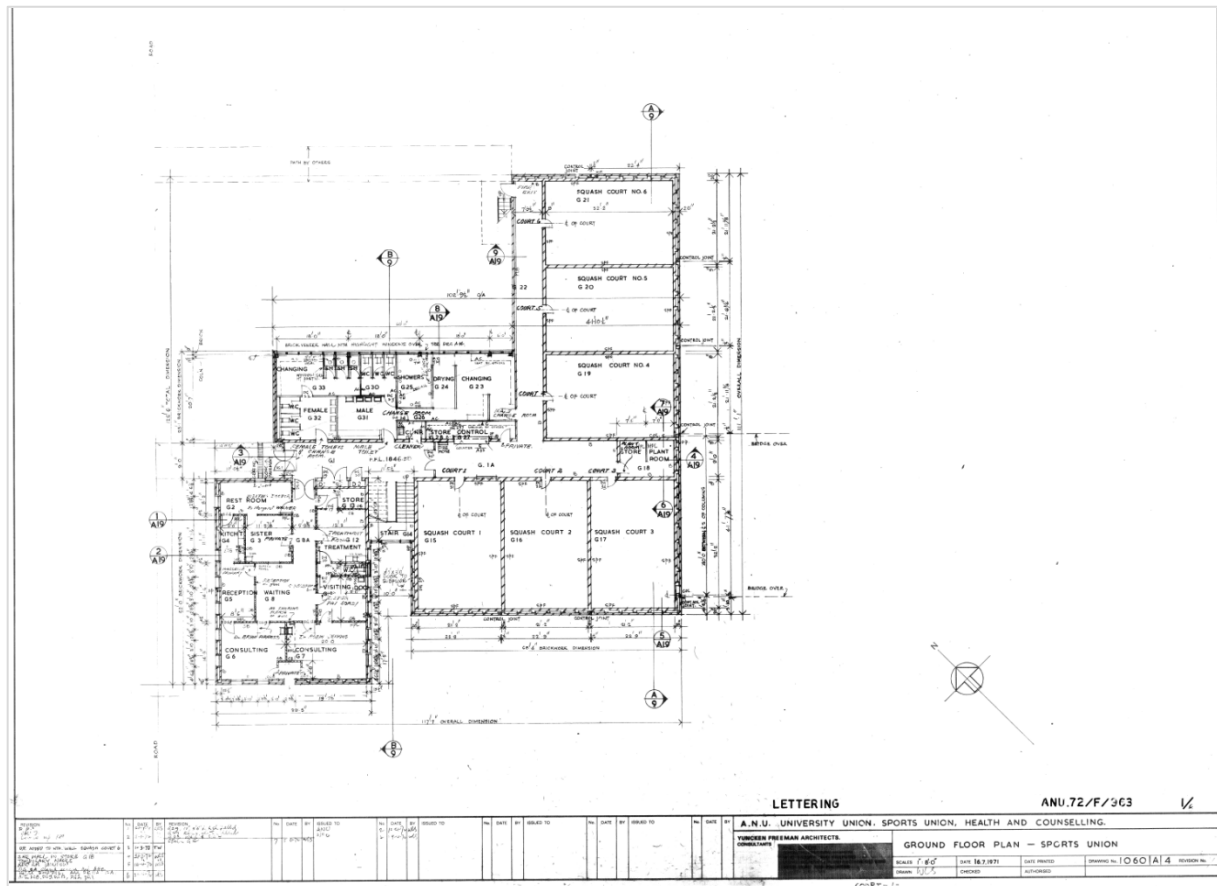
Ground floor plan of the University Union Sports Union, Health and Counselling Building, 1972. (Source: ANU Drawing Office)
